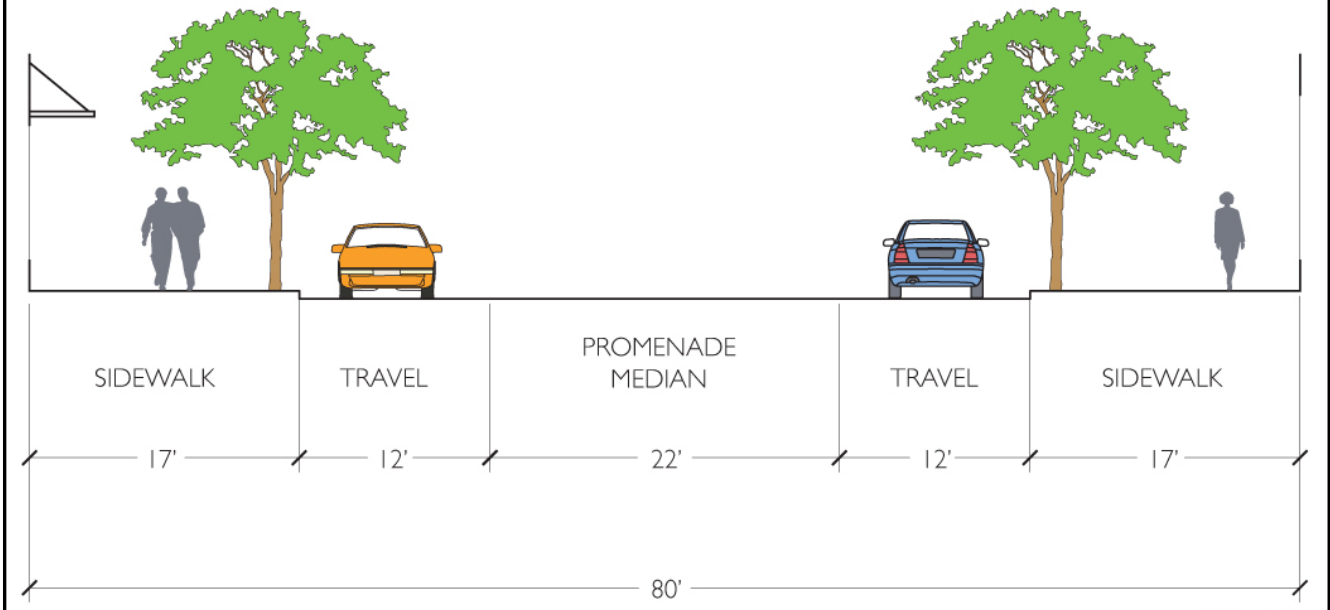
Typical West Broadway Avenue Section Between Hillsdale and Alhambra (for illustrative purposes only)
